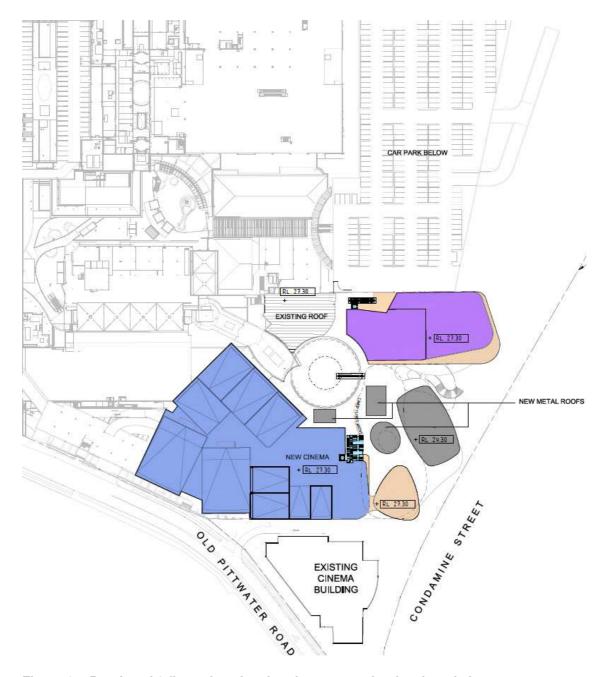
Part Level 3 floor plan showing the proposed redeveloped cinema areas
